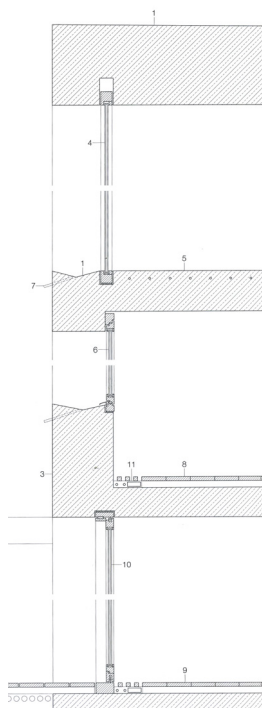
Construction section of single leaf of cast in-situ concrete at the house in Chur; Simple monolithic elevation of cast in-situ concrete
